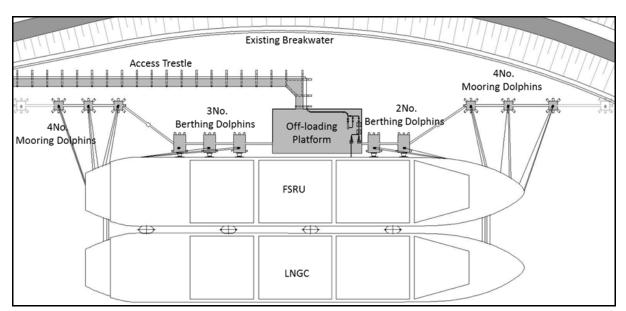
Phase 1 – jetty layout –Piled jetty structure (Source: SRK)
